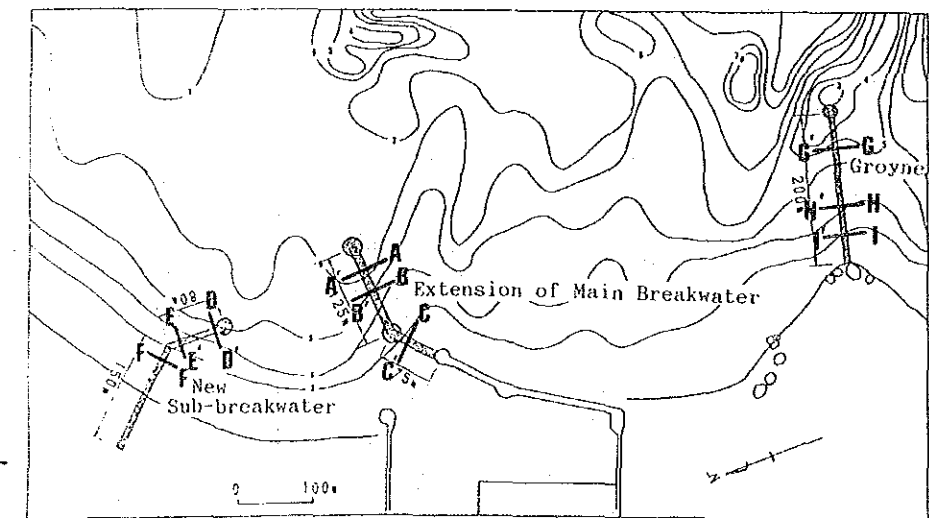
(1) Typical Cross Sections [Main Breakwater]
